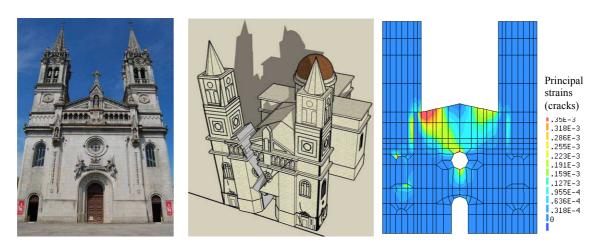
Façade view, crack pattern representation, and numerical model with cracks
